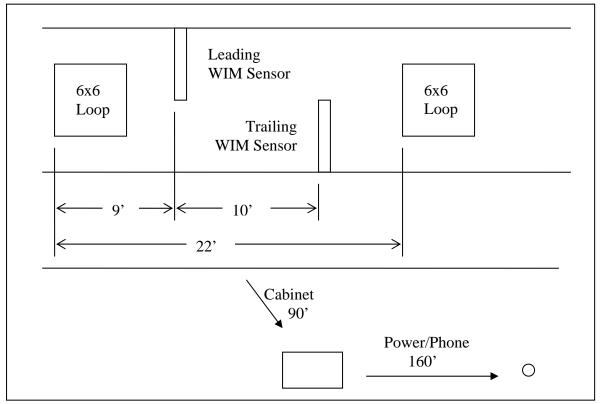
Equipment Layout at SPS-2 site in Washington
